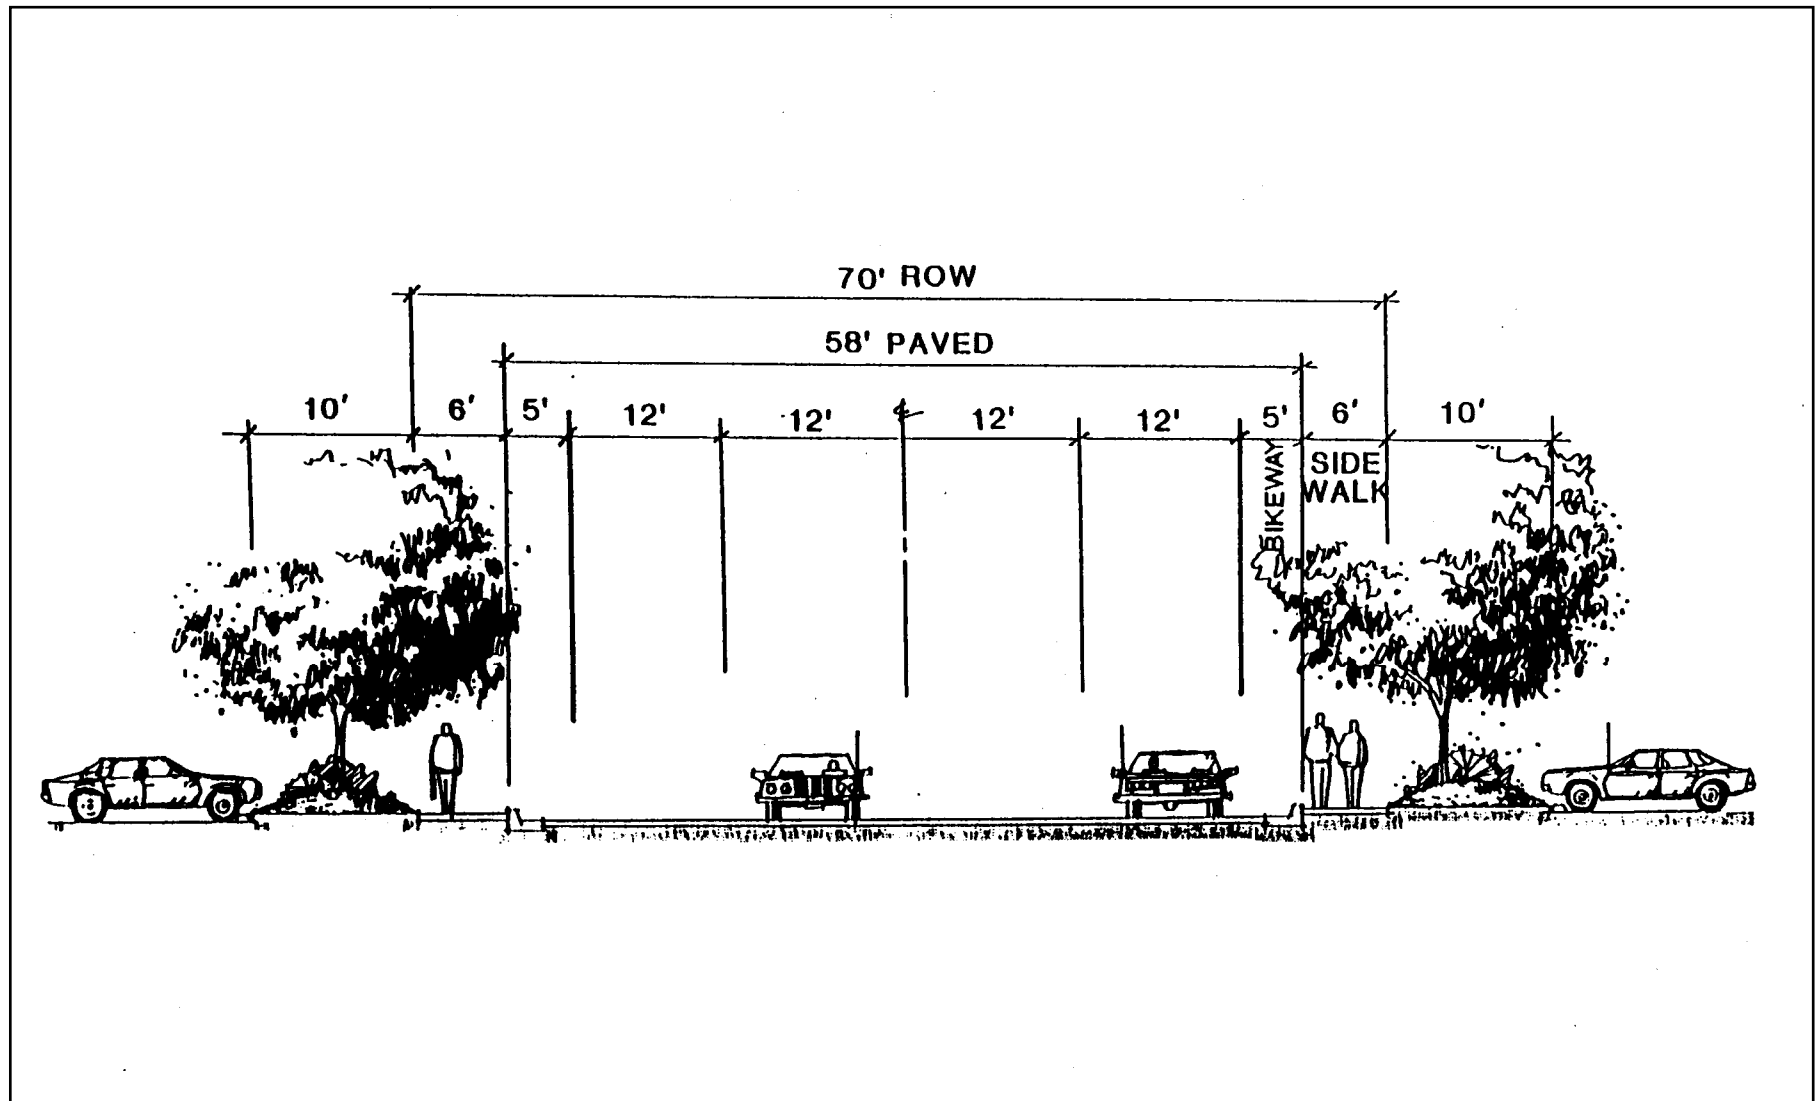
TYPICAL SECTION – ORCHARD DRIVE (In Business Park District)
